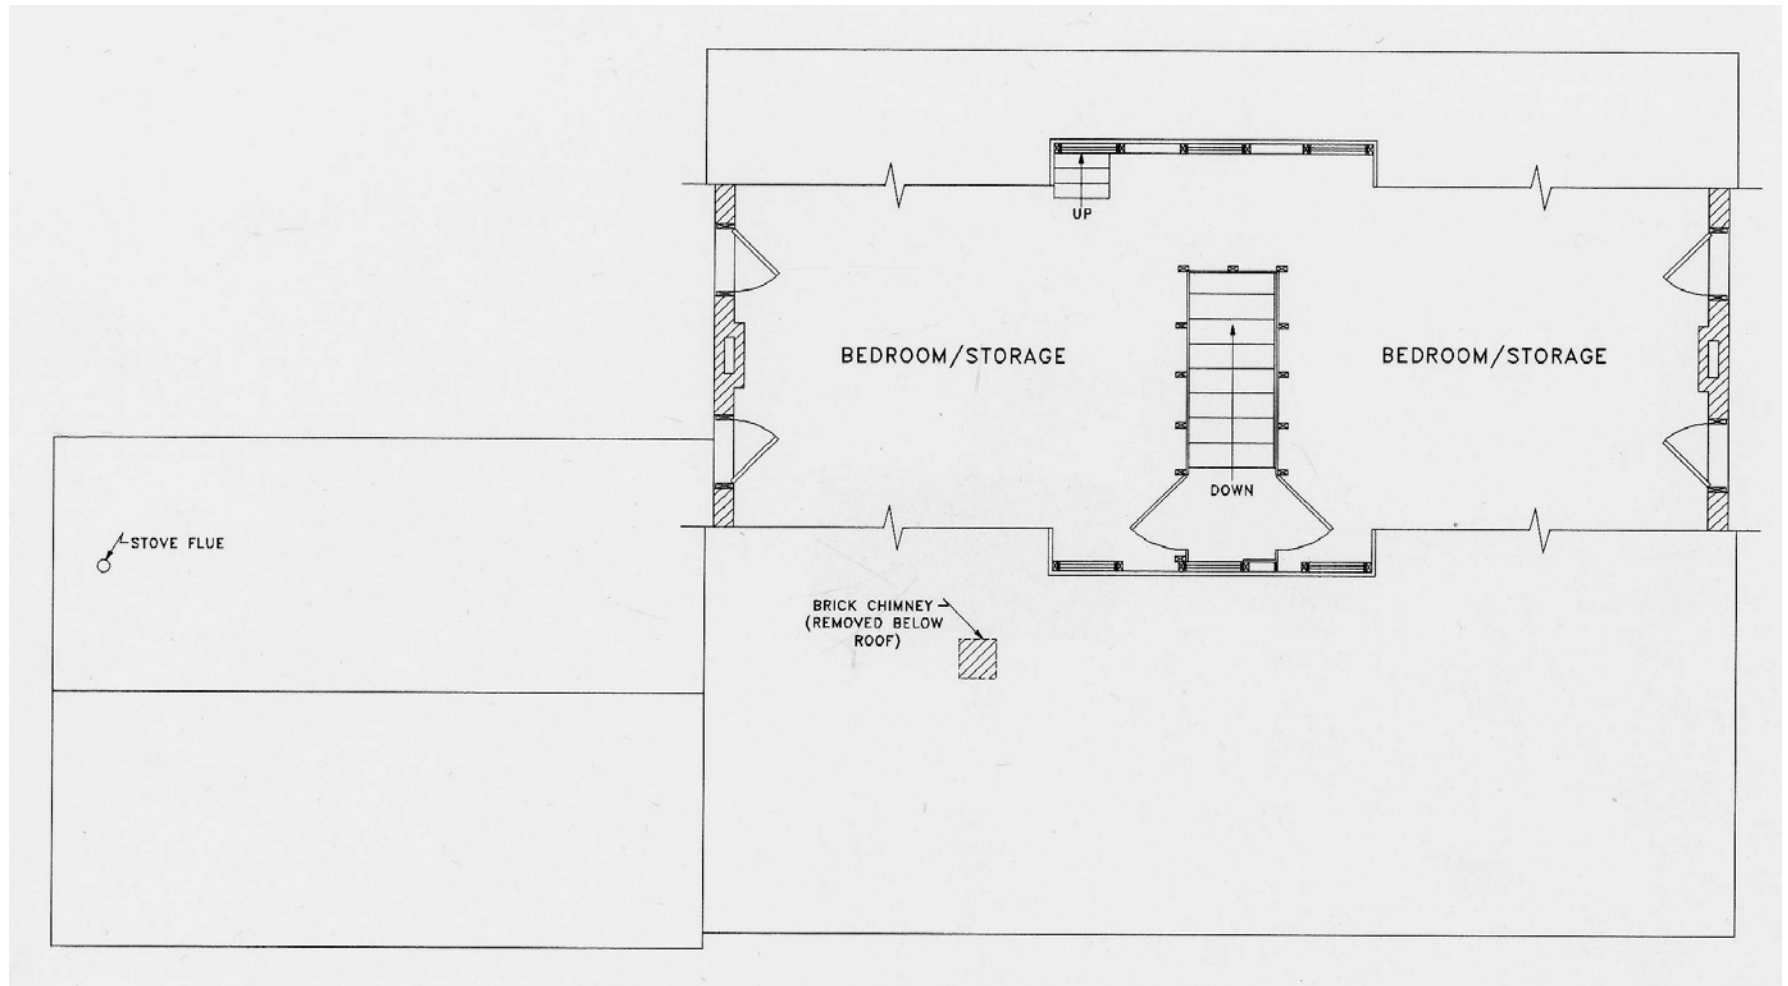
Second floor plan of the Valentine House, showing twentieth century modifications.
